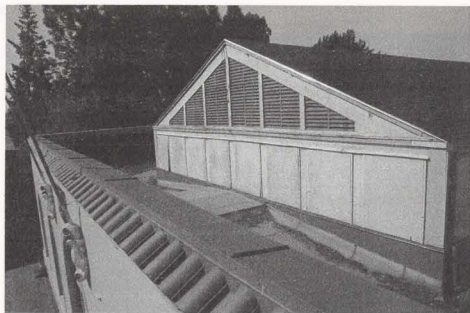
The roof of the poultry Building, showing the parapet, flat roof and clerestory. Photo by author, 2008.
